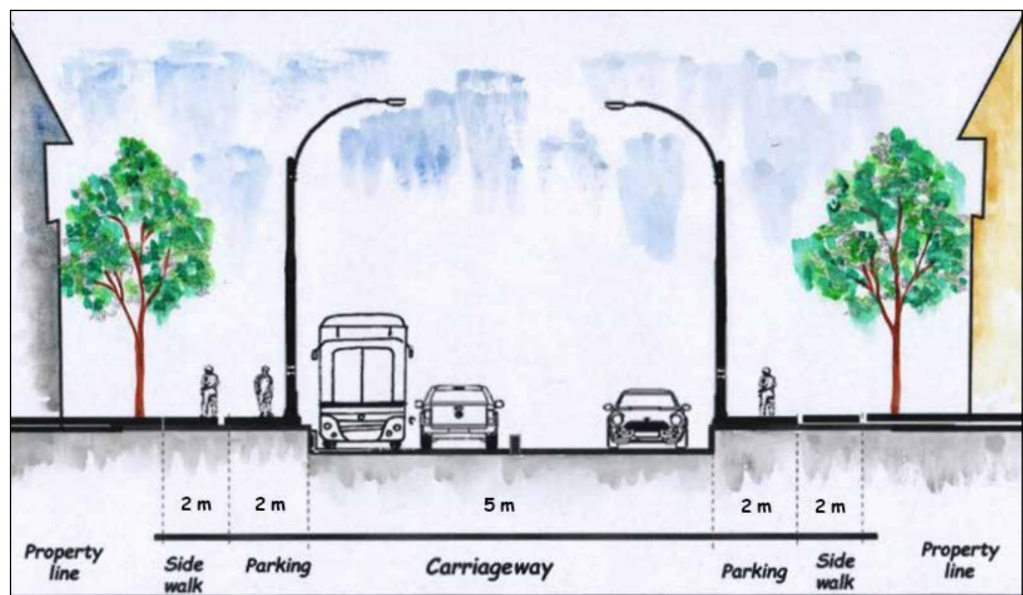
Cross section of proposed Maradana Moragalla road development
